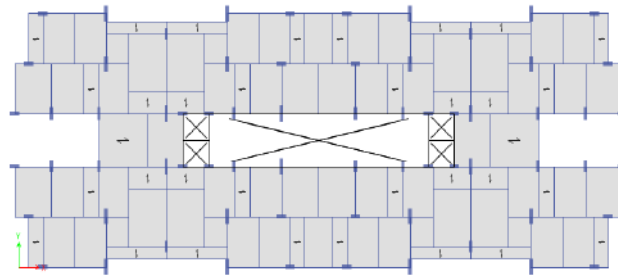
Parking Floor (Ground floor slab) level of Model-3
